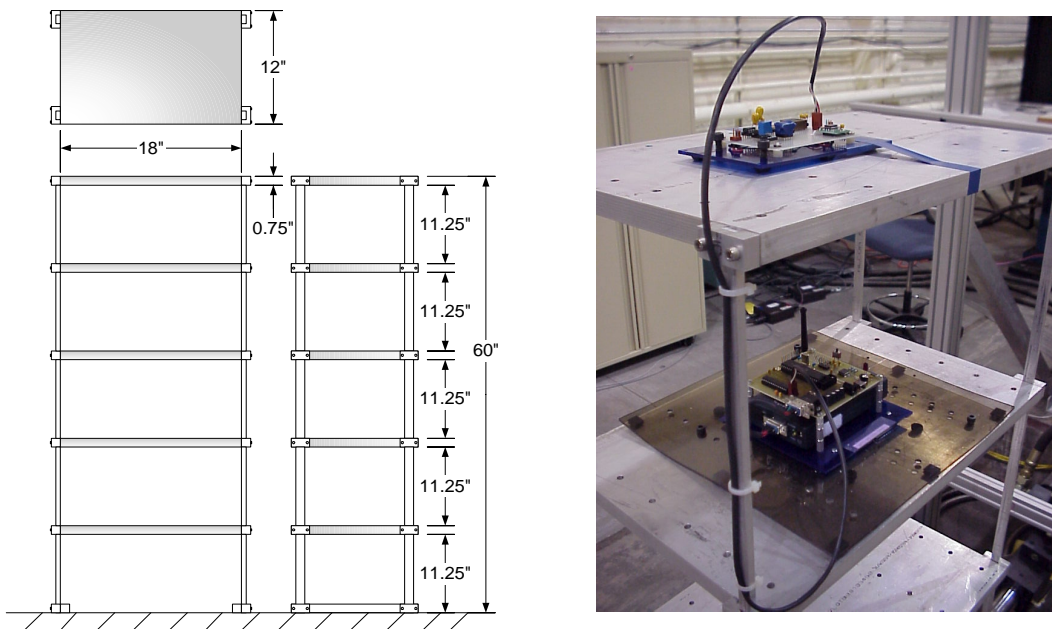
Five-story aluminum test structure – wireless unit located on floor 4 and accelerometers on floor 5
